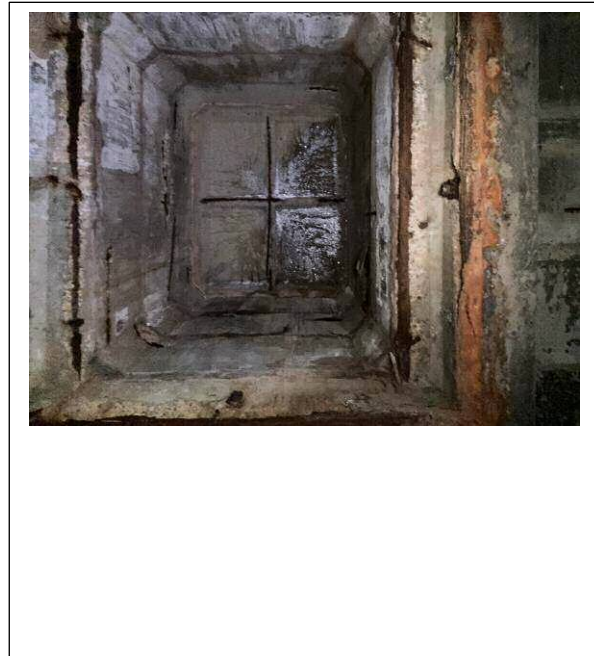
Corrosion to bolts and effect on surrounding concrete.
